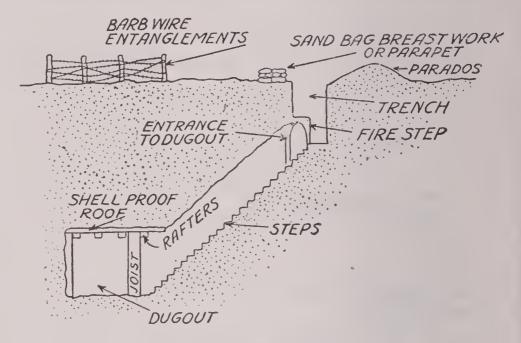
Cross-Section Through Typical Trench AND DUGOUT
